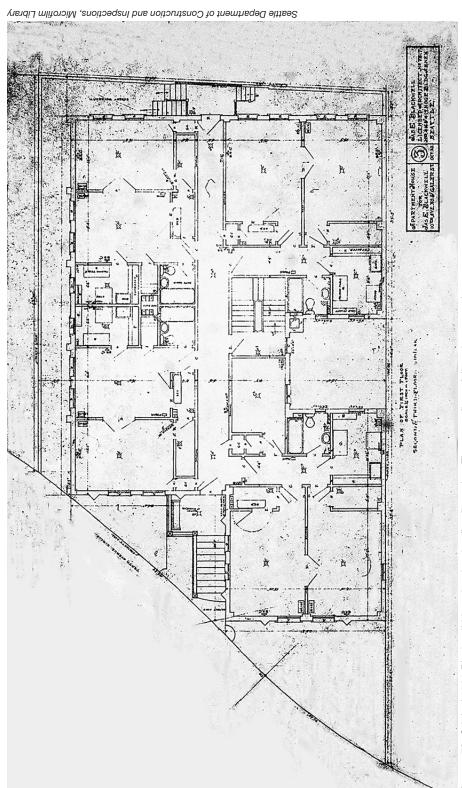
Original 1922 Blackwell blueprint showing first floor plan. The upper floors follow the same plan. (These floors are now considered the second, third and fourth floors.)
